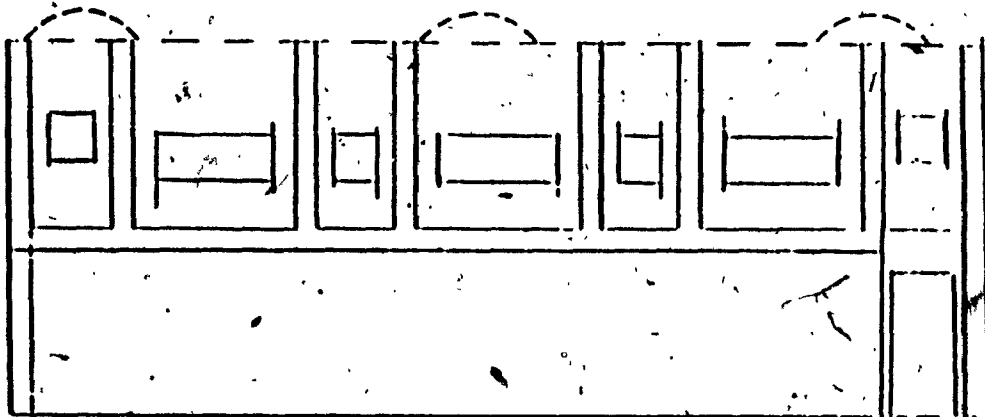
Composition of the OUTREMONT main facade taken from the Architectural plans of LE CHATEAU: C.M.A. #440-1931.
